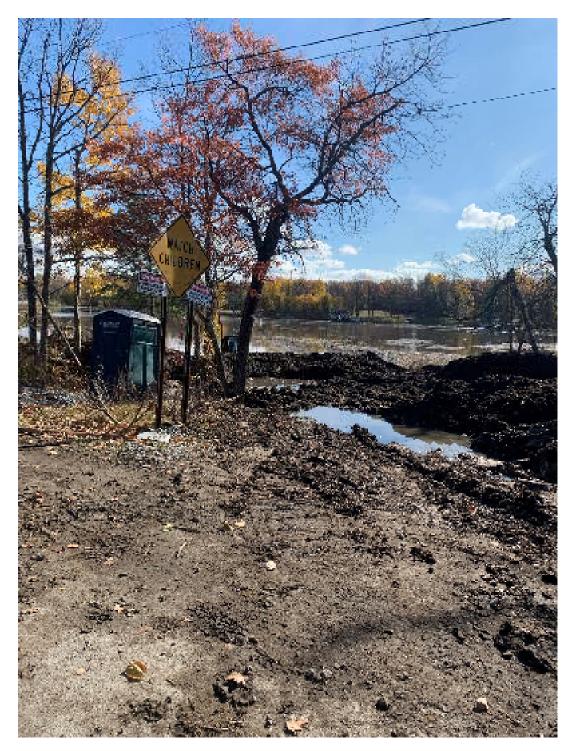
Public access and main staging site for removal and piling of biomass. Photo taken 10/19/2023
